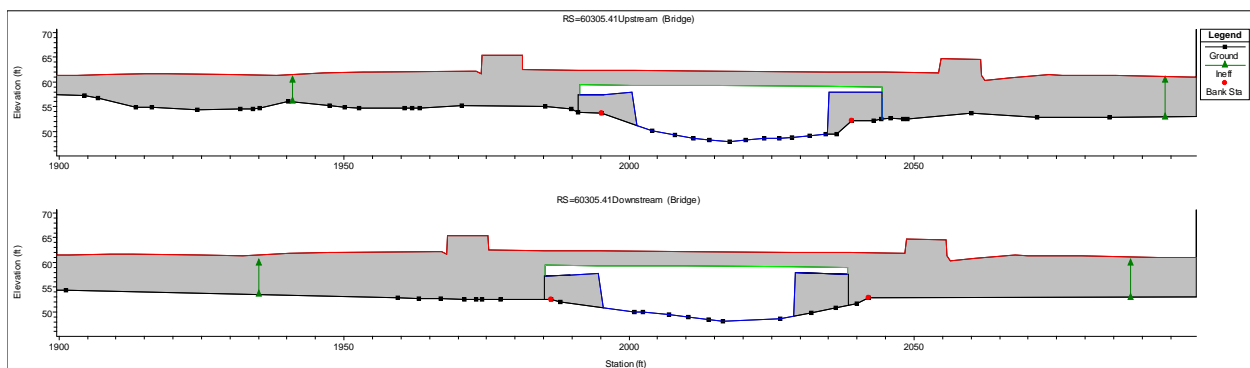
Cross Section of Vaughan Street Bridge in Corrected Effective Model
